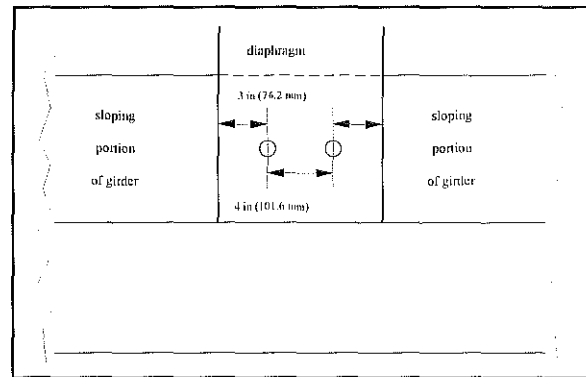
Location of Diaphragm Anchor Bars on Actual Girder.
